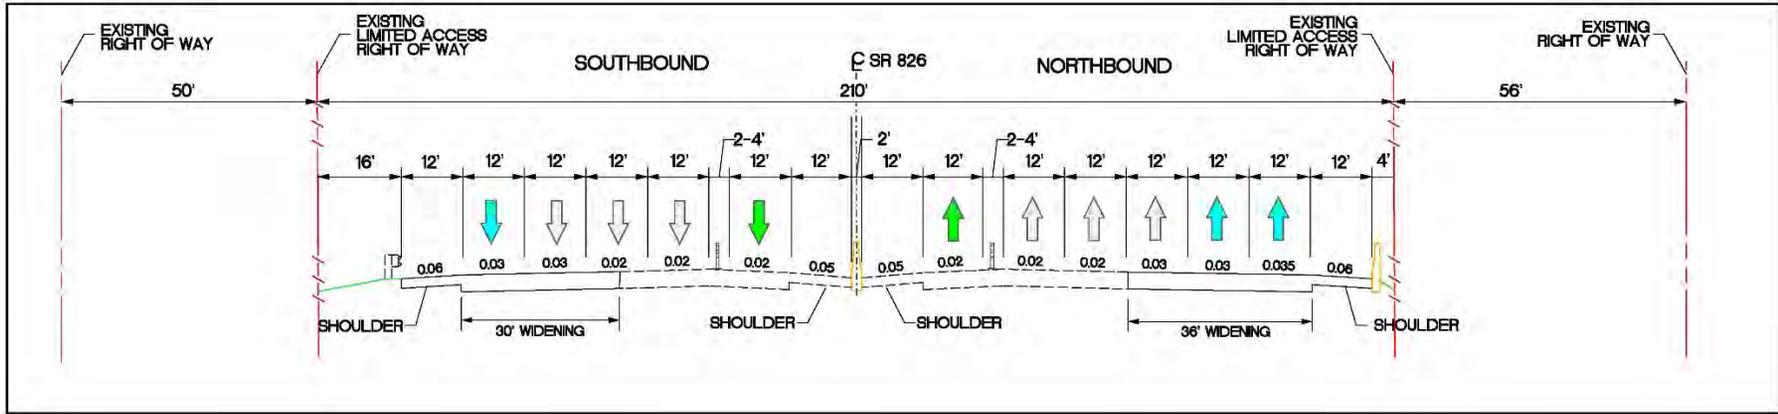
Preferred Alternative Roadway Typical Section between US 1 and SR 874
